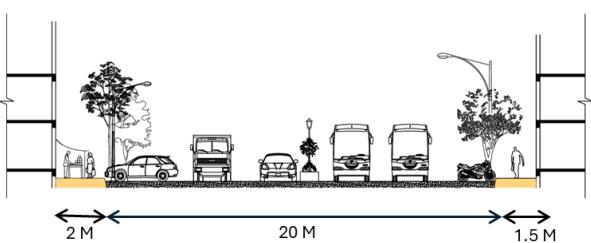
Section D-D' Through Barrack Trunk Road (Primary Roads)
